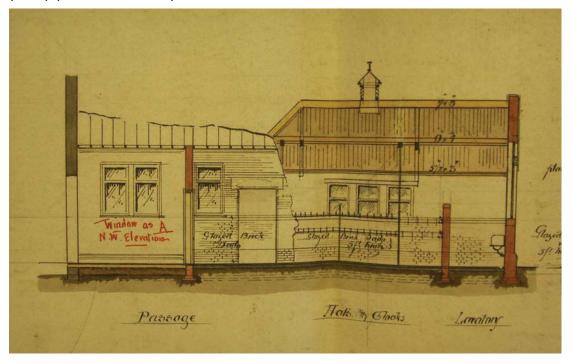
South-east facing section (A-B) through the proposed additions to the north-east end of the building (CRO(B) Z1041 1875-1904)
